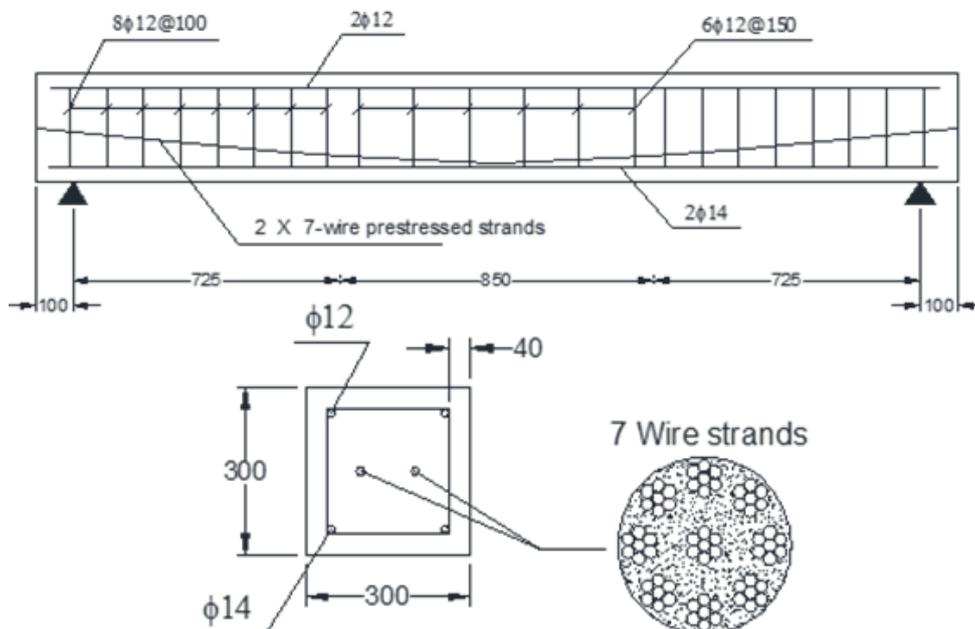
Geometry of the PT beams and reinforcement layout (mm)
